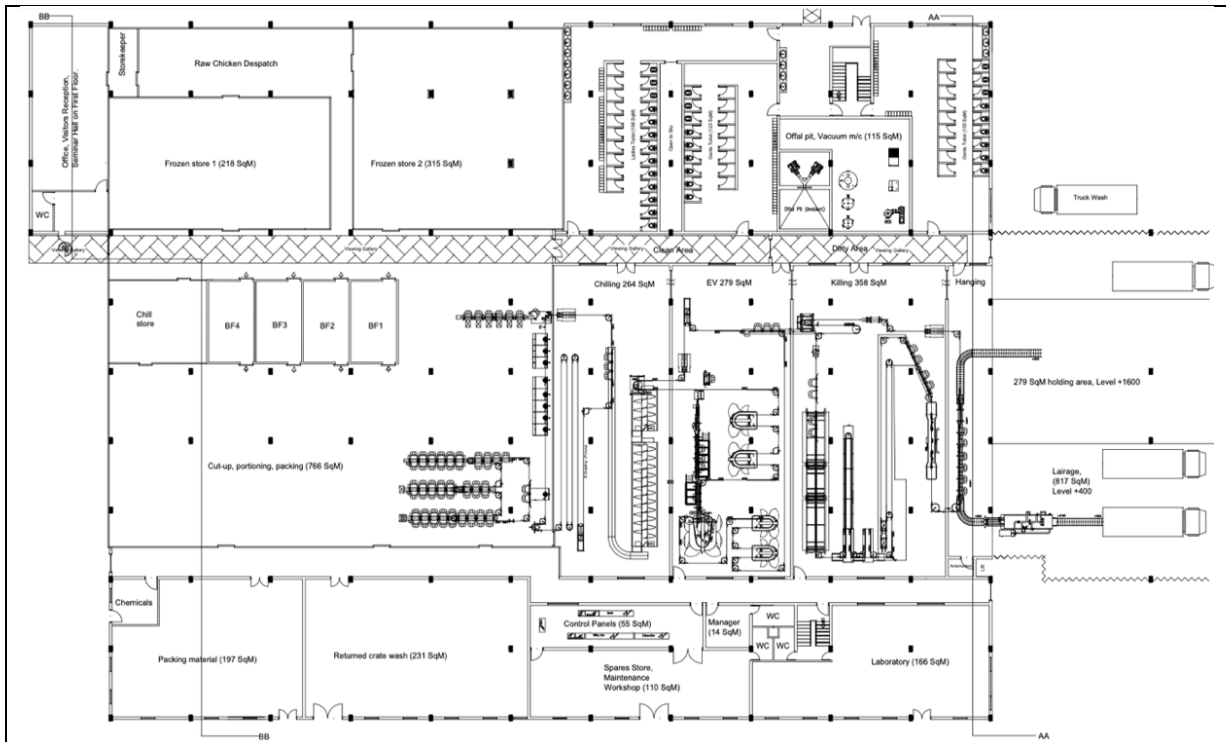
A 4000/8000 BPH slaughterhouse layout design for Sri Lanka. This design incorporates both Inflexible and Extrudable Blocks but the former is additionally covered by an extension of the sheet steel roof owing to the heavy rainfall in Sri Lanka. Because of this a lot of unused space became available for use in our design. Figure 31 shows how we used this space for service areas. And figure 32 shows how the viewing gallery extends through the Extrudable Block and leads all the way to the office block where visitors are expected to begin and end their tour.
